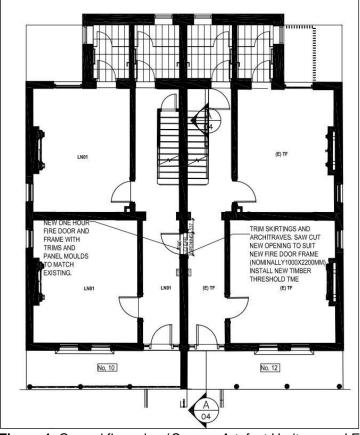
Ground floor plan (Source: Artefact Heritage and Environment)
